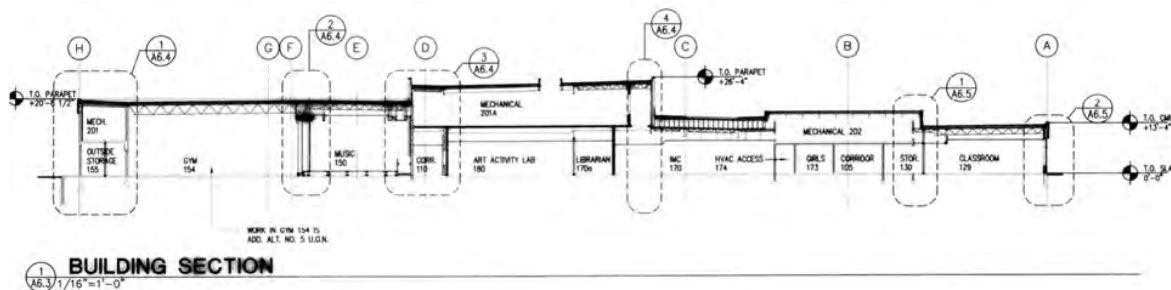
Building X-section through addition, 1999 construction drawings, 1/A6.3.
